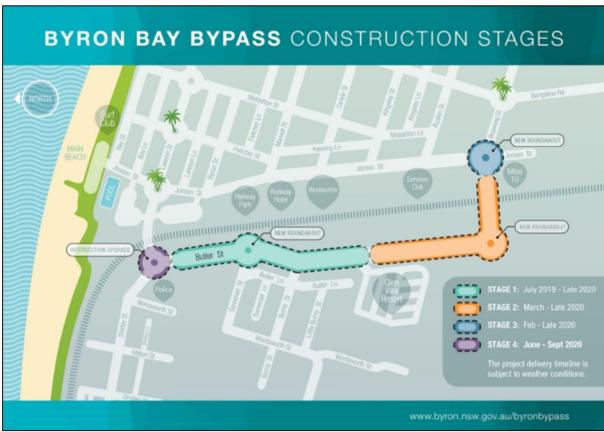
| Byron Bay Bypass Overall Layout Plan (Source: BSC)
